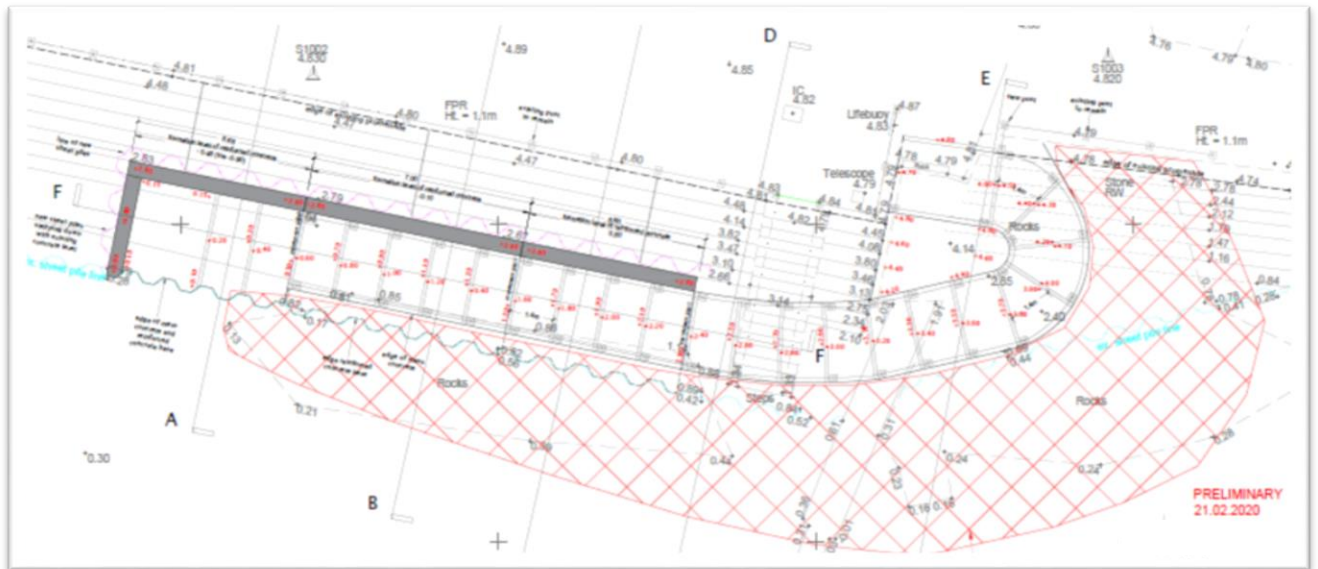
Plan of Proposed Beach Access Stepped Ramp
